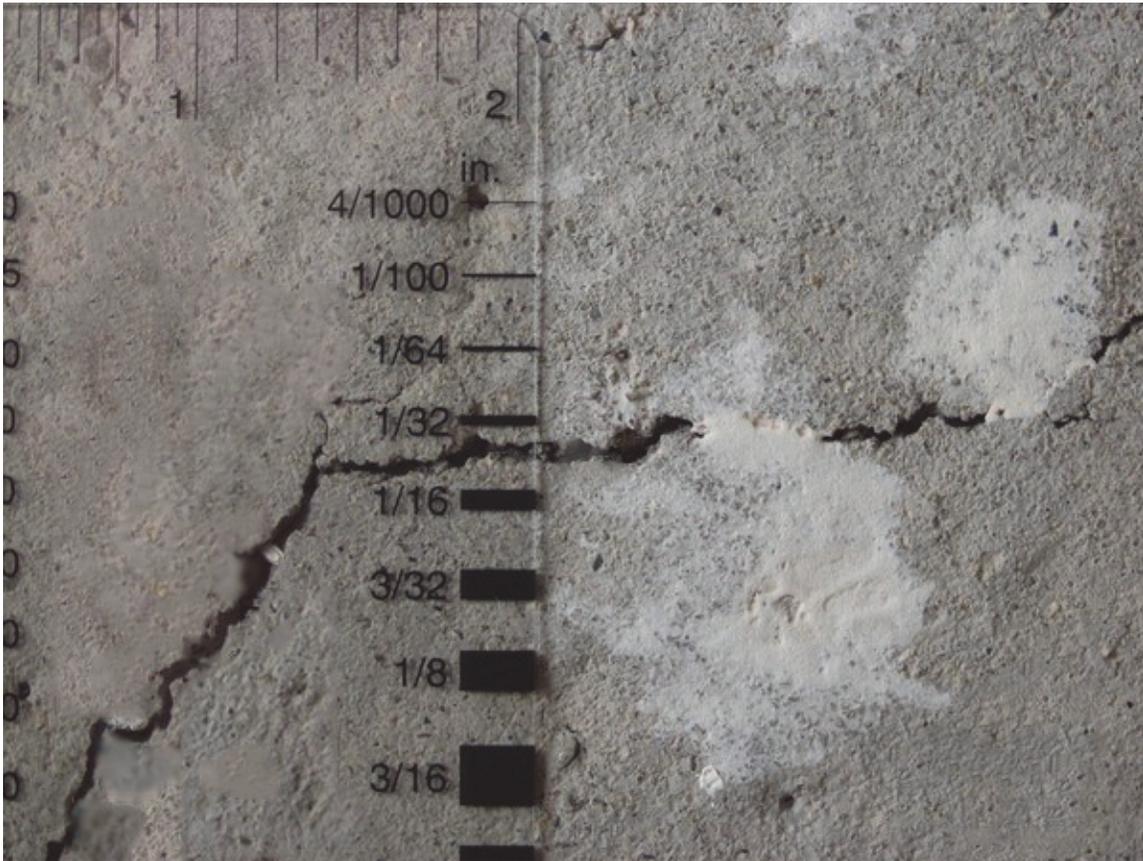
Dabs of drywall joint compound within shrinkage crack in concrete slab-on-grade floor (photo credit: Exponent).
